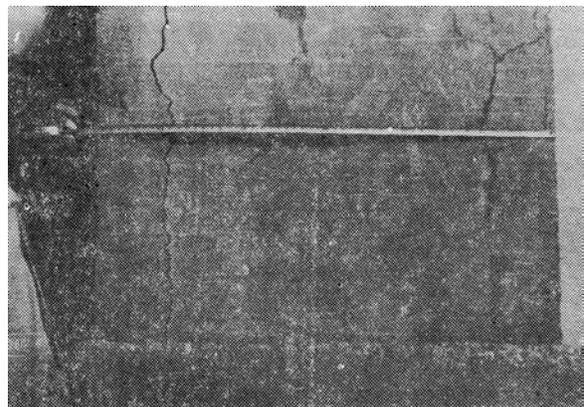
The left lock pier cracked at the Yonghe Shiplock.
